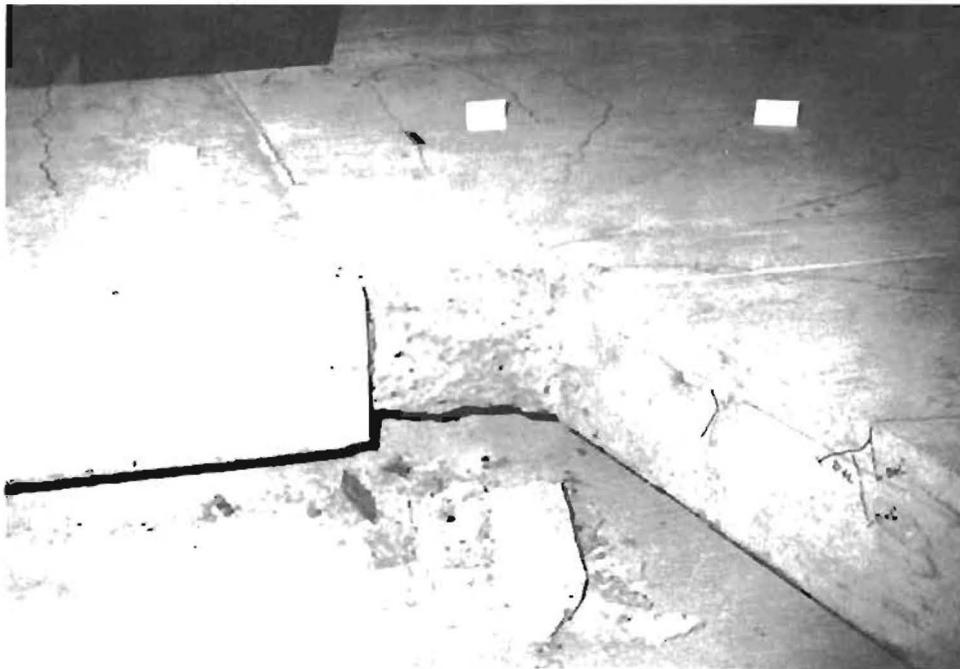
(b). Final failure in secondary compression after yielding of steel in tension.
